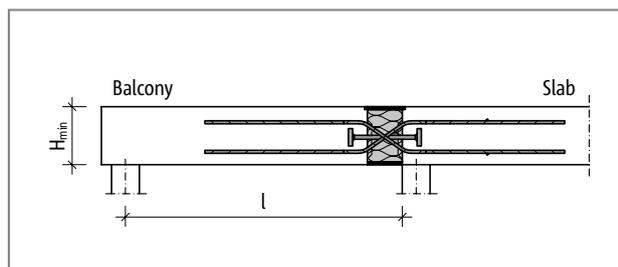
Schöck Isokorb® XT type Q-P-VV: Static system
